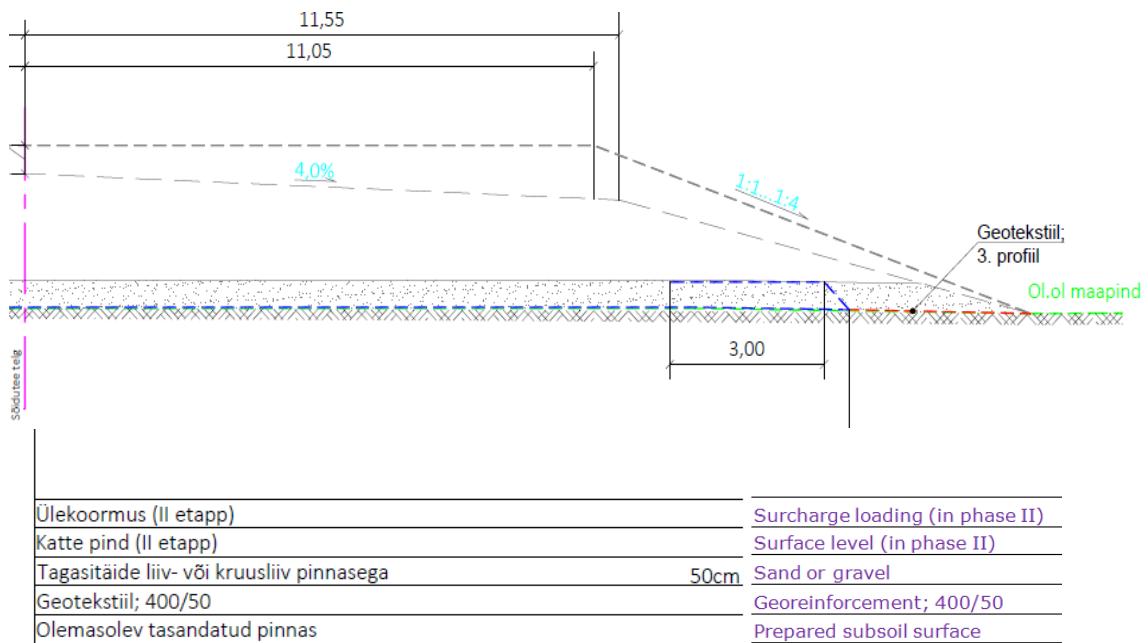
Cross-section of test section 4. Light weight aggregate reinforcement.
